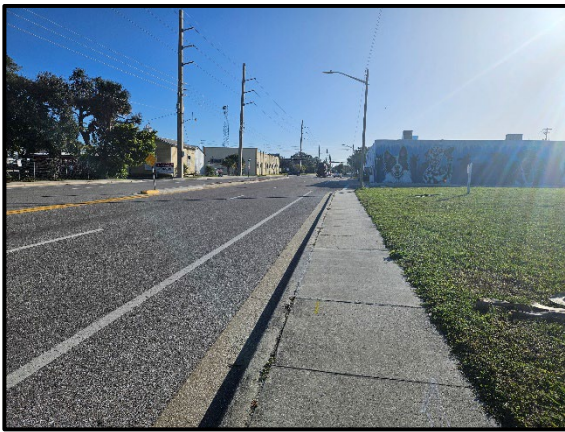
Coconut Avenue/10<sup>th</sup> Street intersection from southwest corner, facing northeast.
